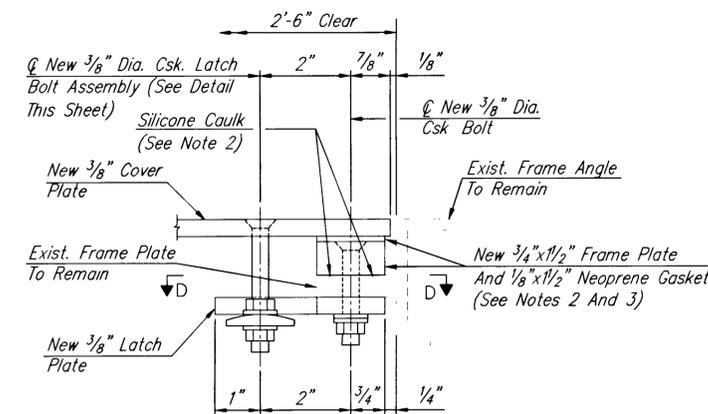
DETAIL - FRAME AND COVER RETROFIT FOR EXISTING TYPE-D JUNCTION BOX
